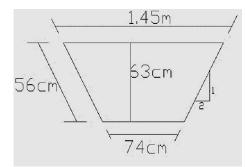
Trapezoidal Drainage types A=y (b+2y) P=b+2h
